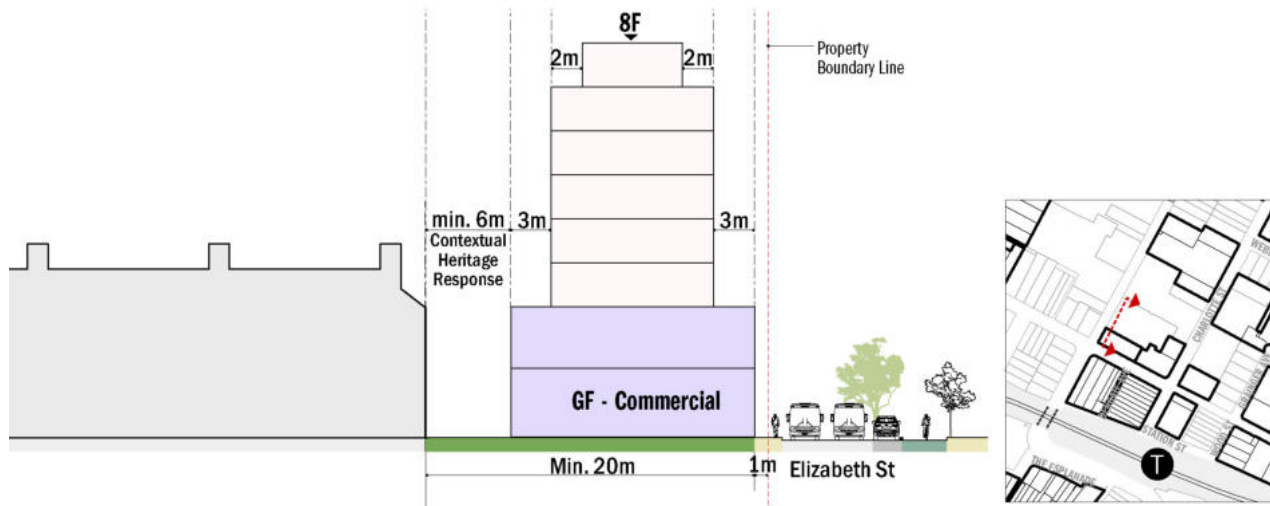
Ashfield Centre North – Elizabeth Street Section (West of Alt Street)
